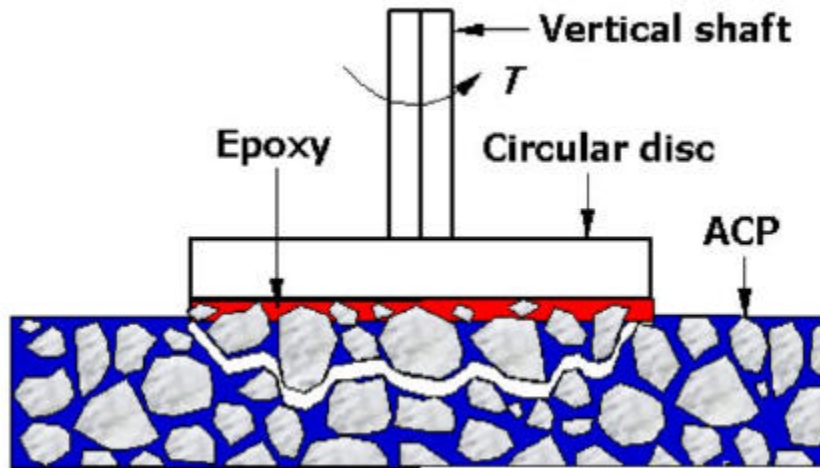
Modified Torsion Test for Shear Testing of Asphalt Concrete Pavements (ACP)
